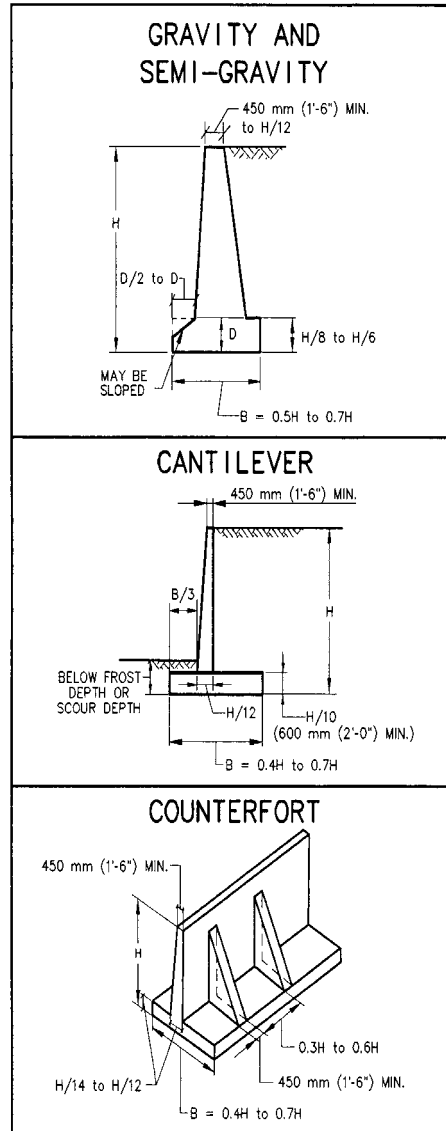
Common Dimensions for Conventional Retaining Walls (after Hunt, 1986)
